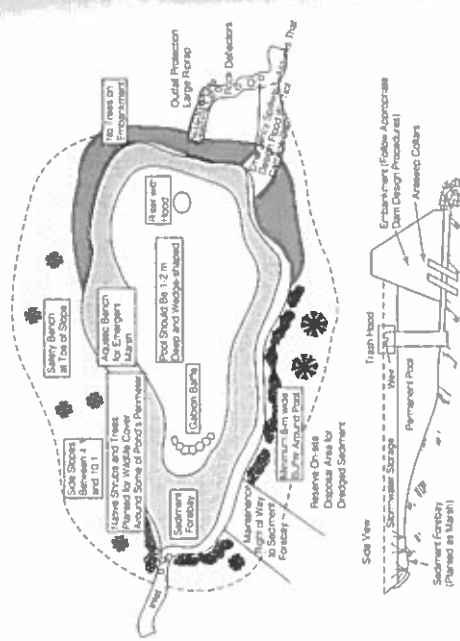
Layout of detention pond. Source: Schueler (1987).
